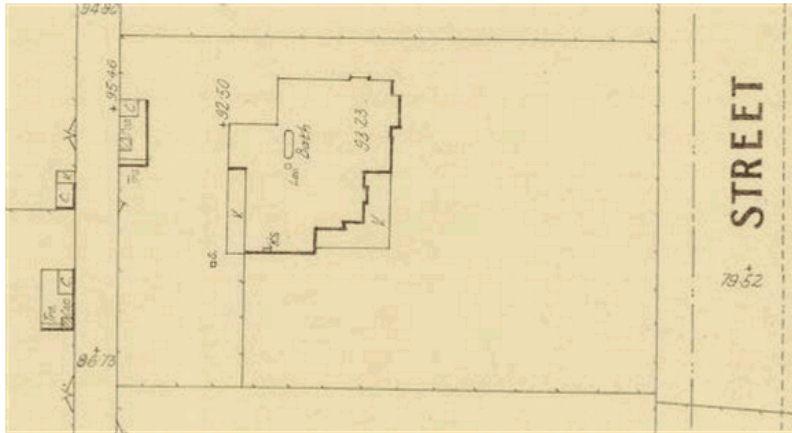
Extract from MMBW detail plan no 1777, dated 1907, Town of Malvern (SLV)
